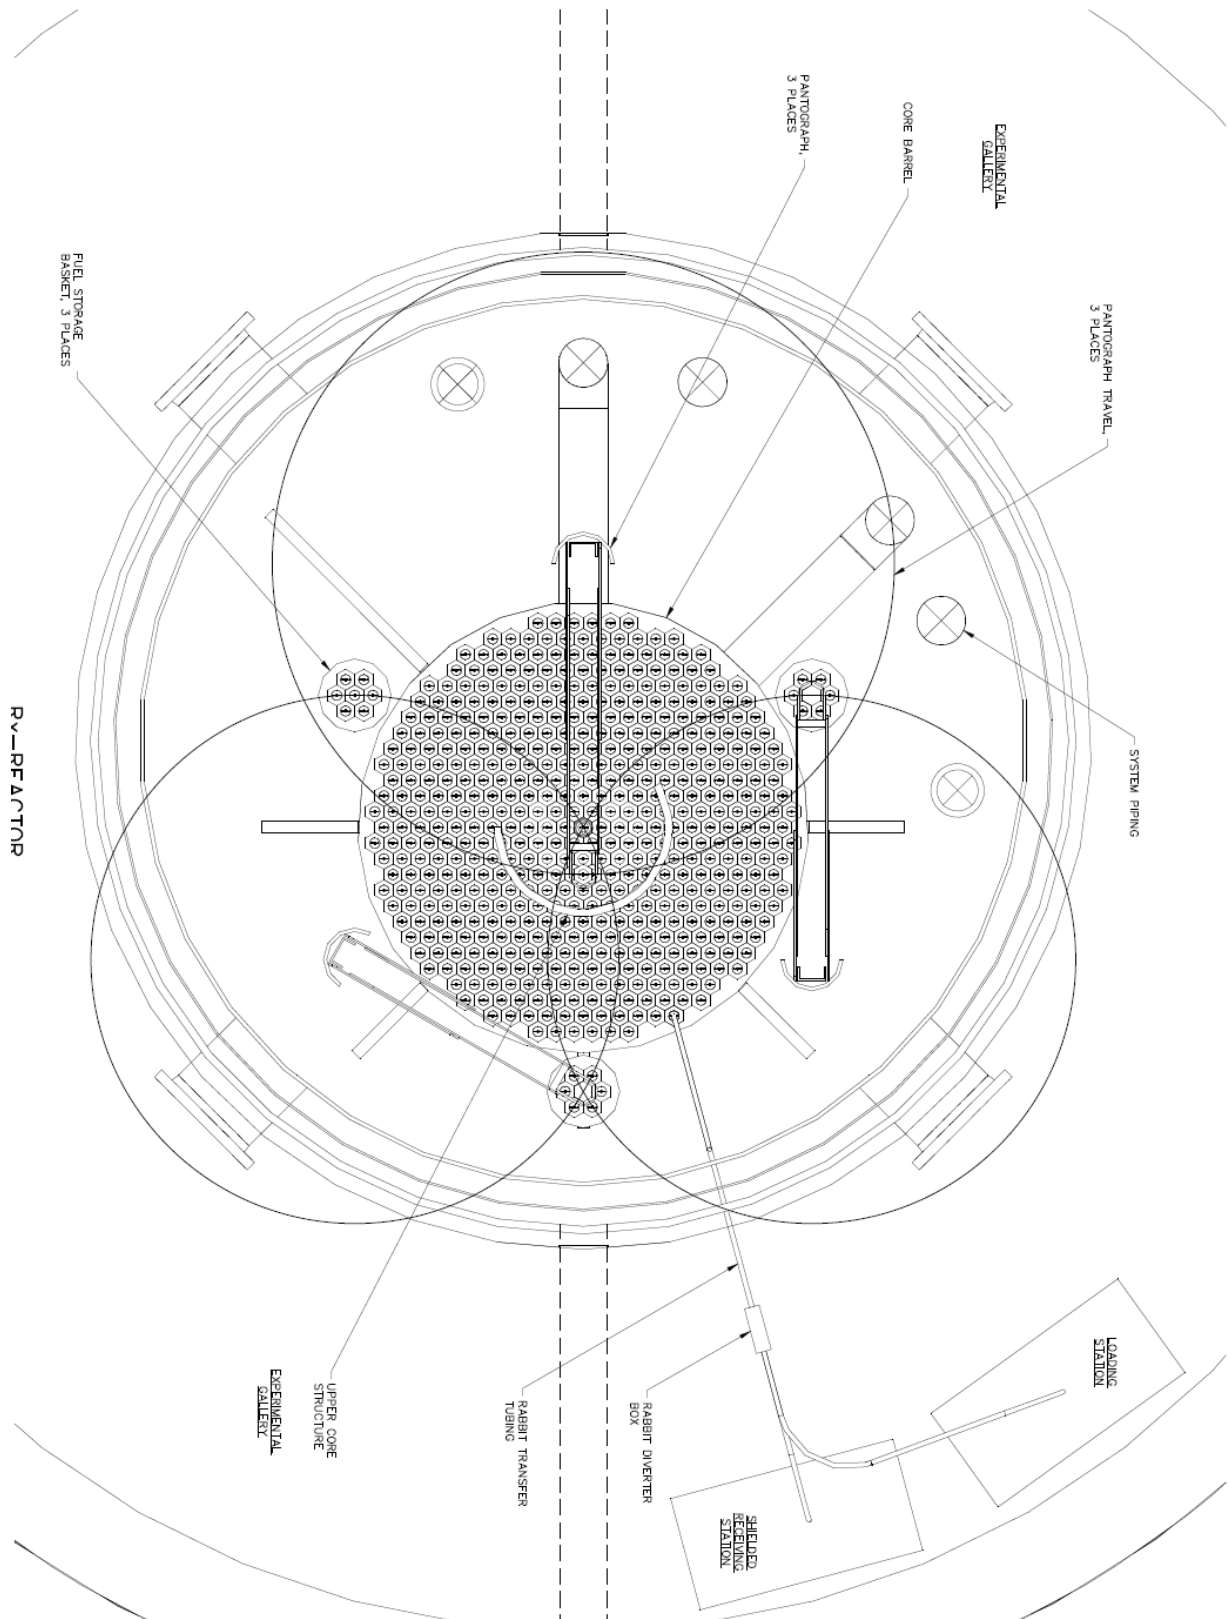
Cross-sectional view showing the reach of the three fuel handling machines and the three fuel storage baskets.
